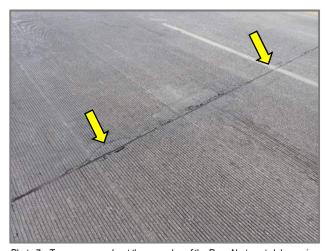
Transverse cracks at the rear edge of the Rear Abutment slab wearing surface (looking southeast in the westbound lanes).
